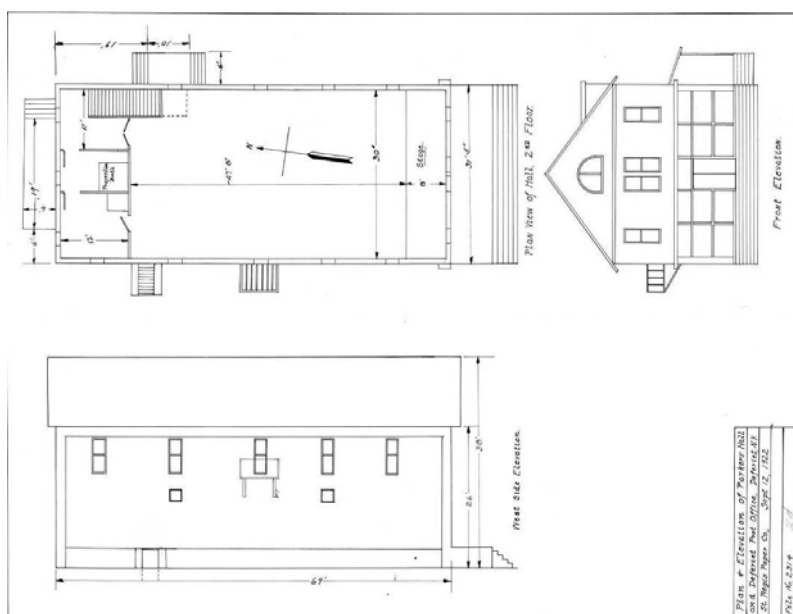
Original second floor plan and front and west elevations of Parker's Hall.
